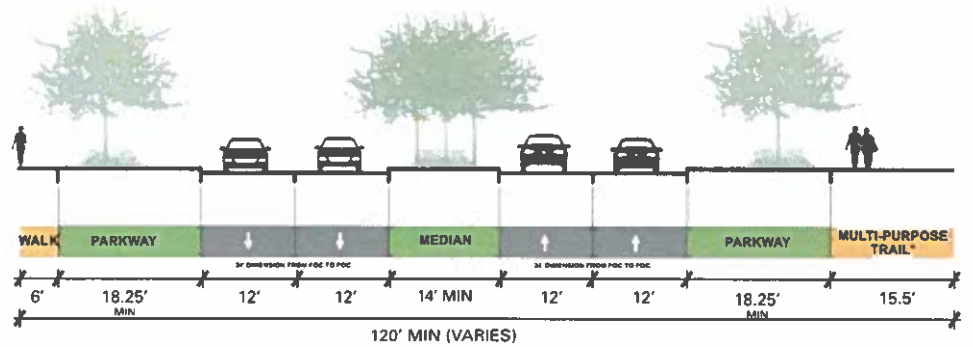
EXHIBIT A - PROPOSED THOROUGHFARE PLAN
